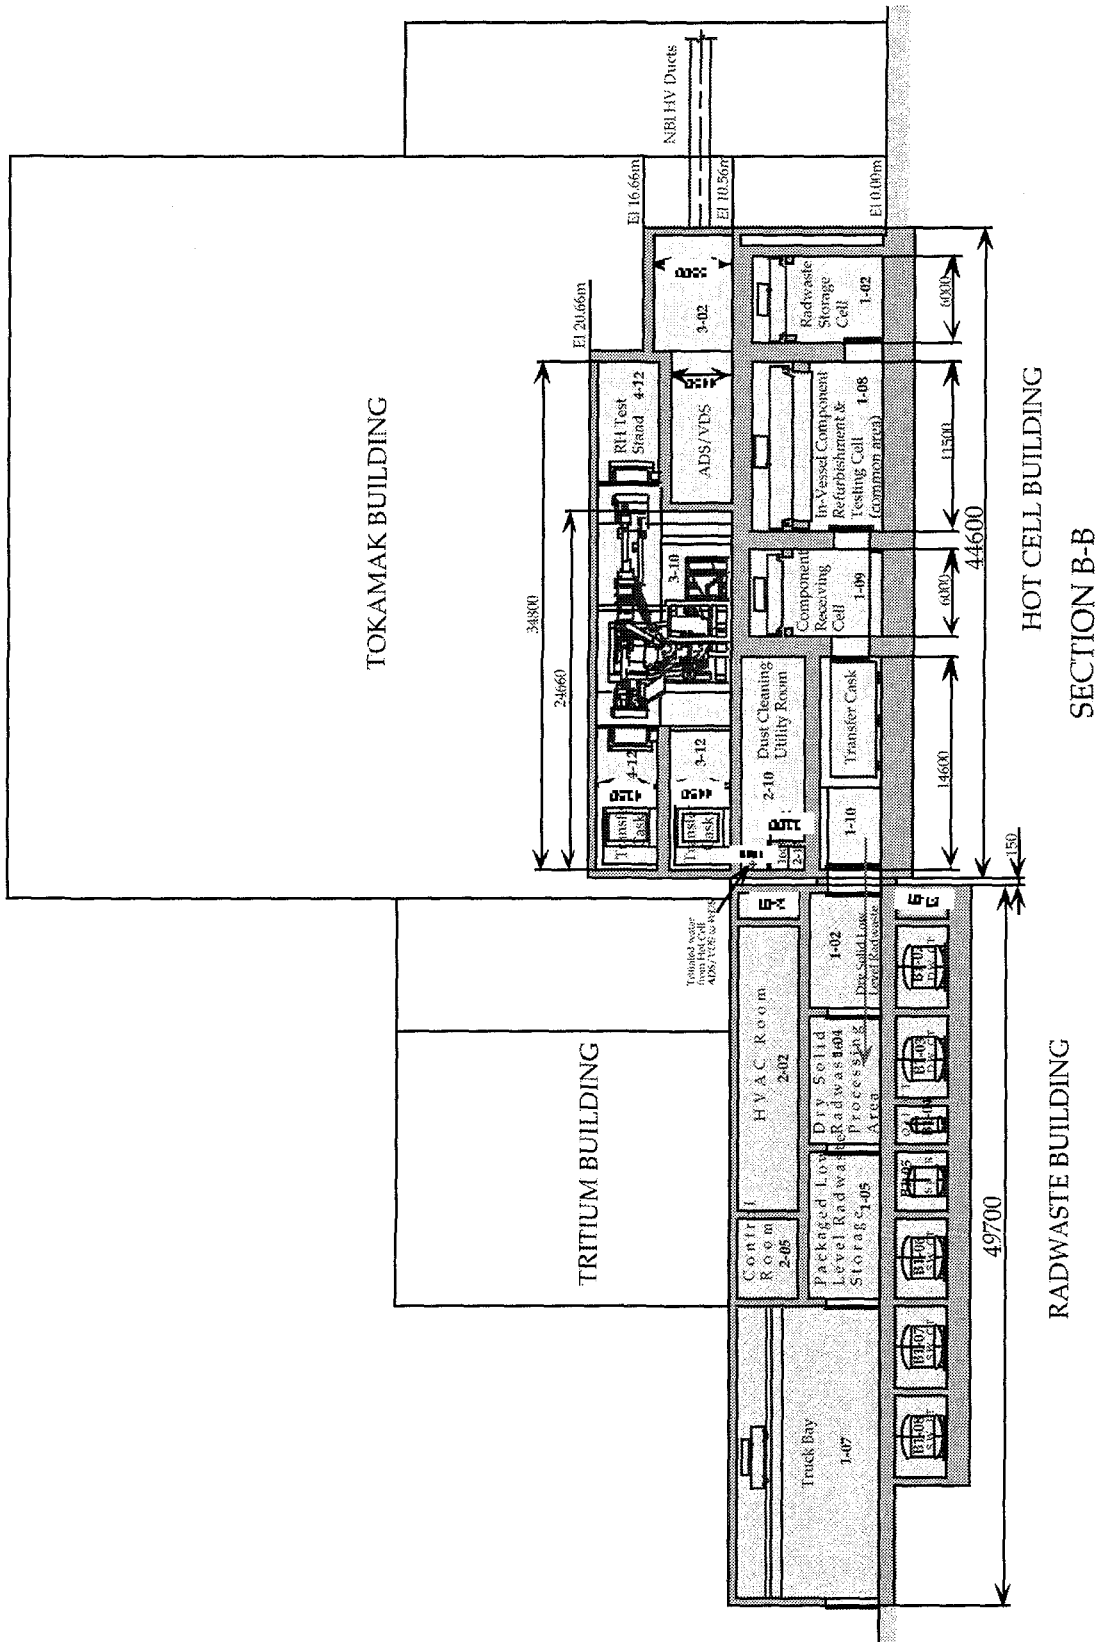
Hot Cell Building Vertical section BB in Figure 5.2-1
